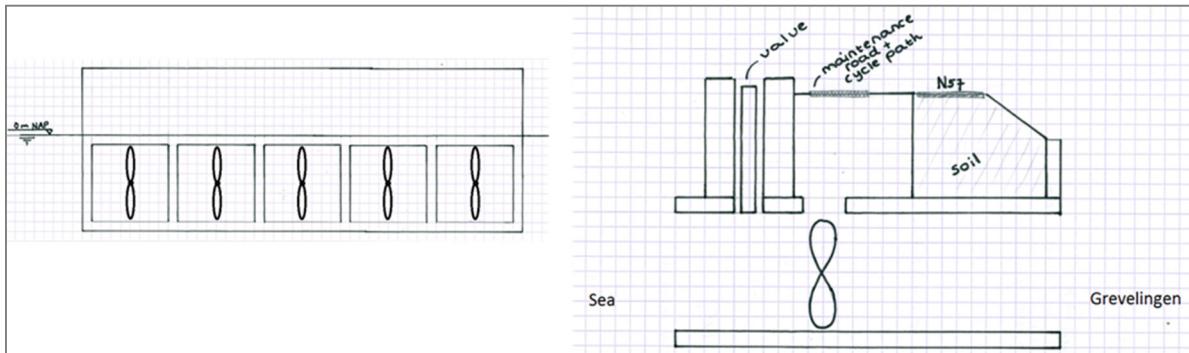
Variant 2C, 'Slender ducted structure' front and cross-section
